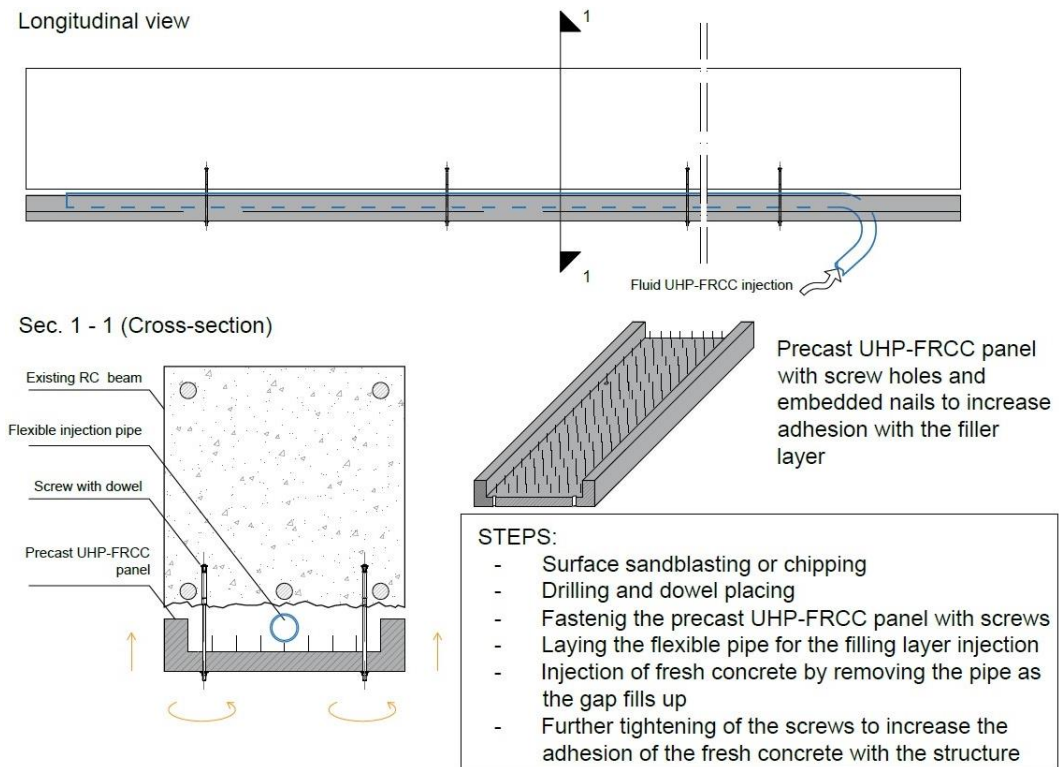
The proposed method for the retrofitting of an existing RC beam and the steps for assembling and fixing the panel to the existing structure.
